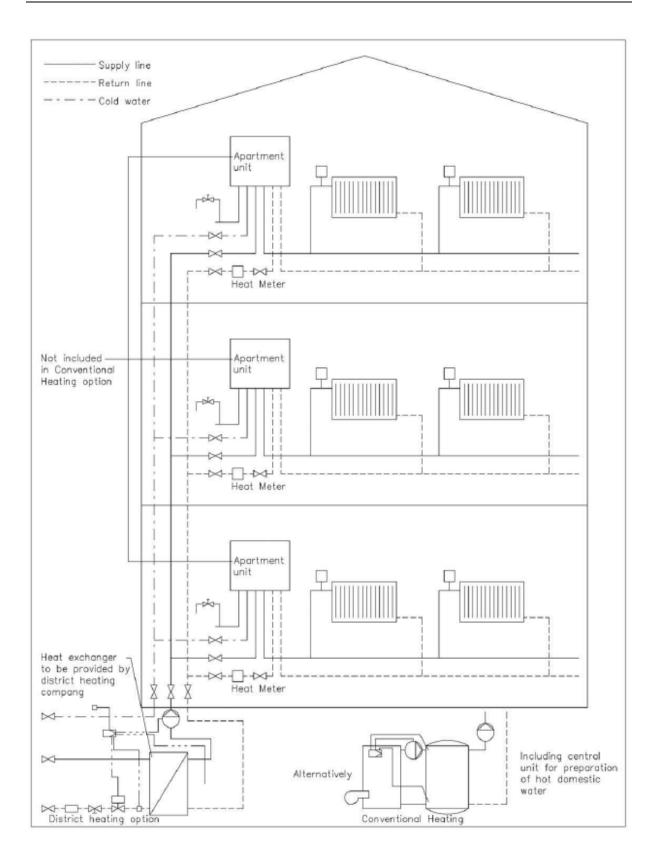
Schematic showing DH Arrangement & Conventional Heating Arrangement in a Typical Apartment Block
